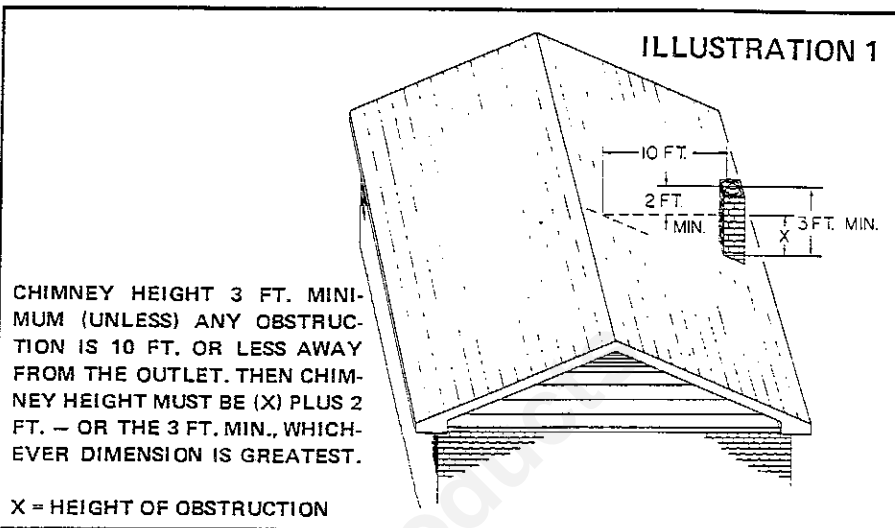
shows the minimum height for a masonry chimney installation. For factory-built listed chimneys refer to the chimney manufacturer's instructions for minimum and maximum height requirements and minimum clearance to combustible construction. For either type of chimney installation the top of the chimney outlet must be at least 15 feet above the floor on which the heater is installed.
